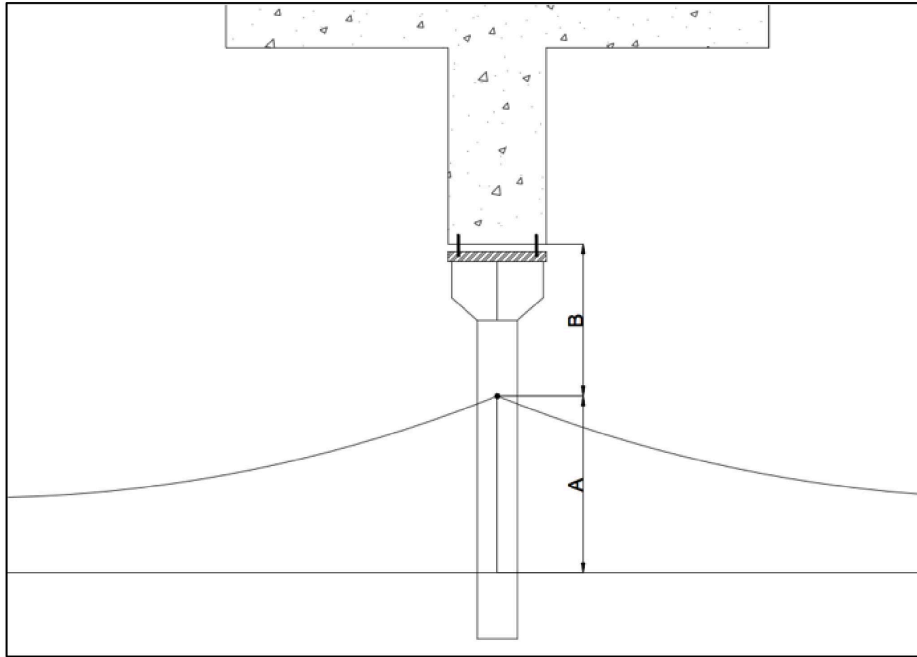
Cantilever suspended from concrete beam (different fixing arrangement)
